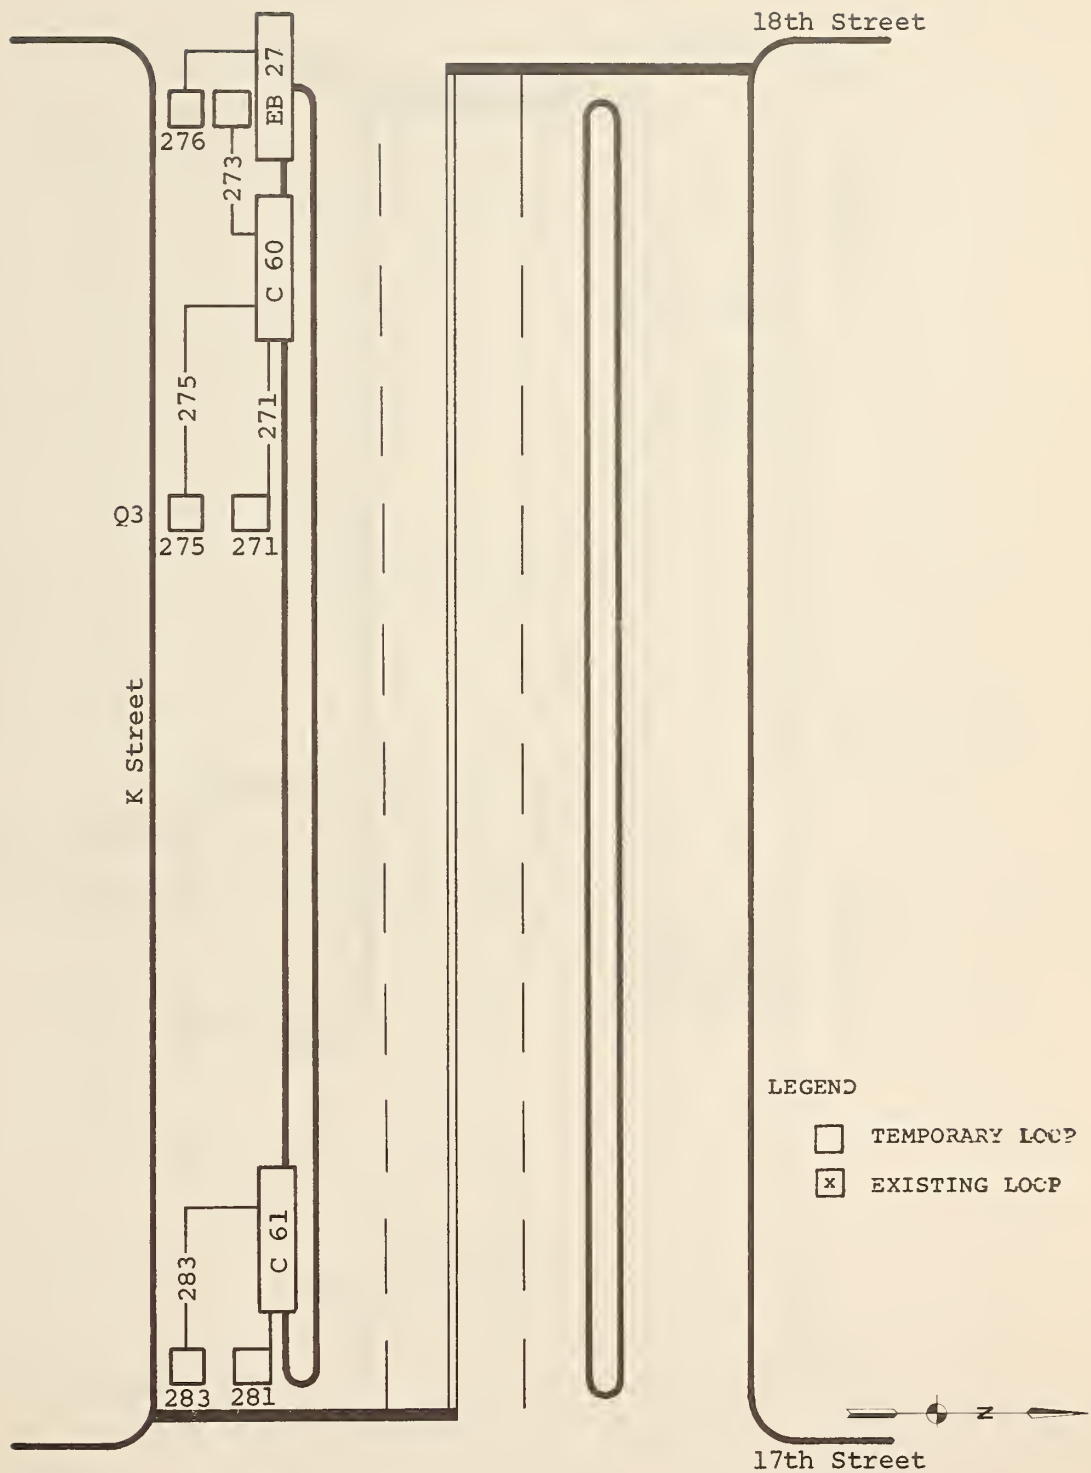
Detector configuration, K Street eastbound frontage road between 17th Street and 18th Street.
